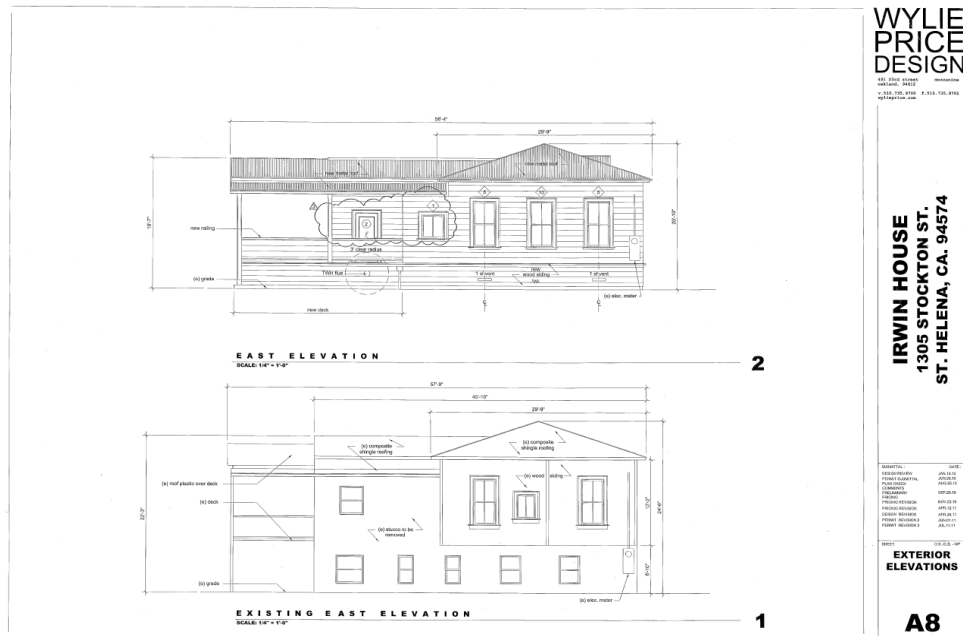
Architectural Drawings of the southeast elevation (Willie Price Design, 2011).
